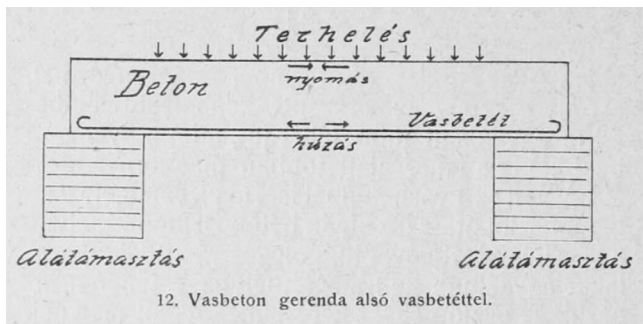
Reinforced concrete beam with lower reinforcement¹² [p. 176].
